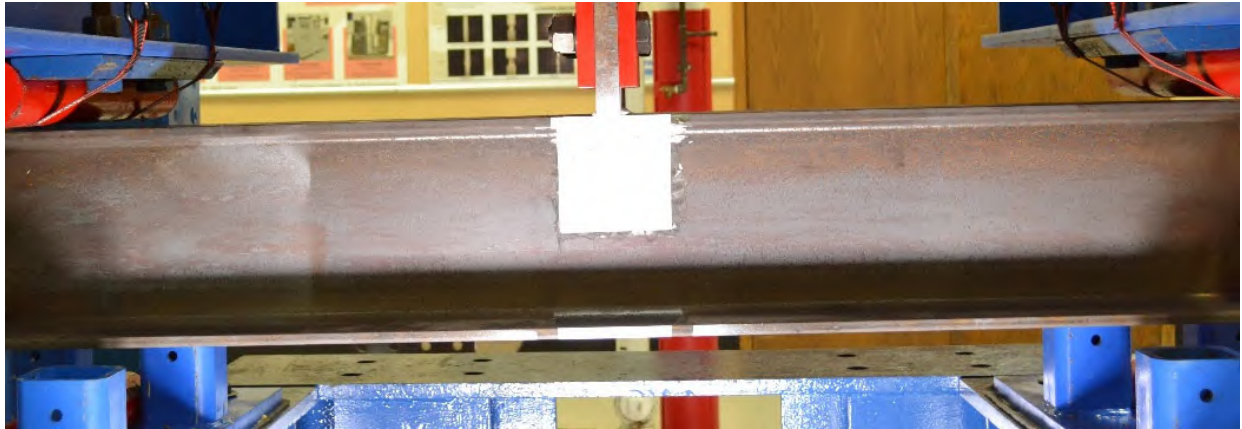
Weld condition of W16X31-ST-E0 after testing (Side 1)
